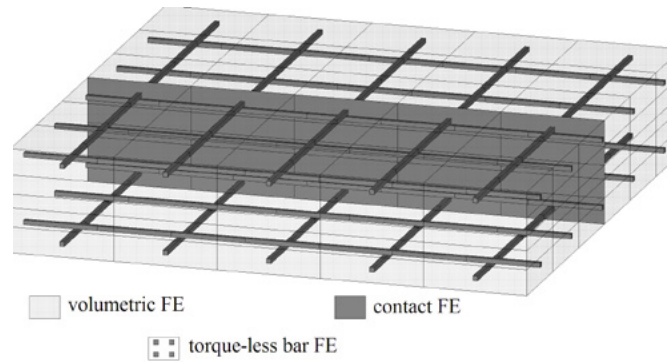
Schematic finite element mesh of a monolithic reinforced concrete slab with a construction joint.
